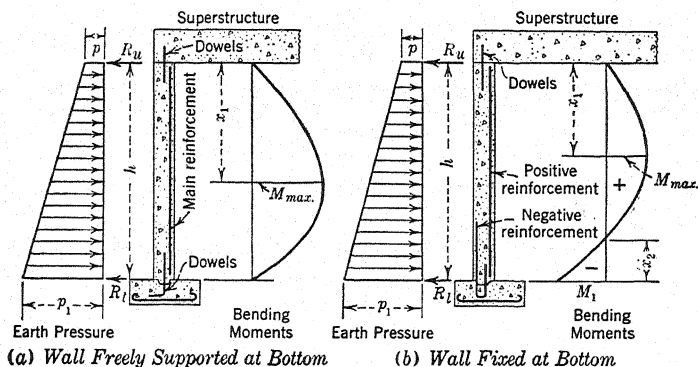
Abutment. Wall Supported at Top. (See p. 417.)
